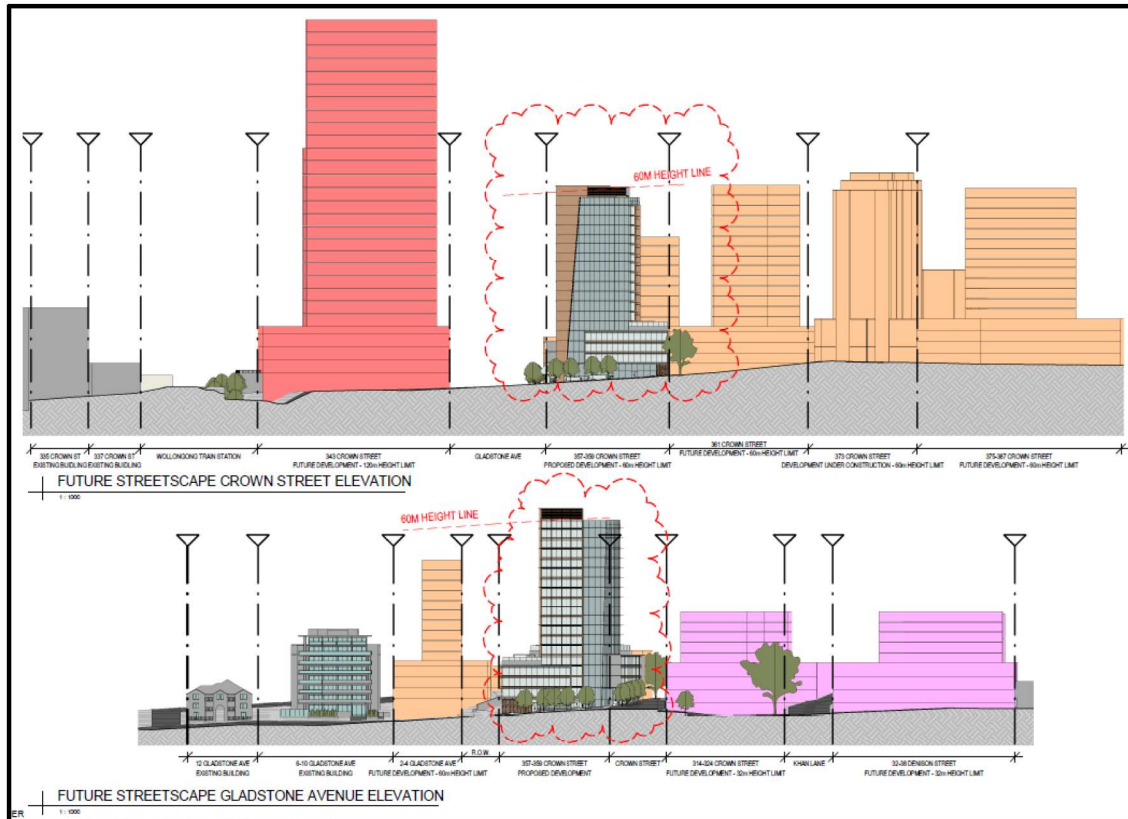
Proposed Streetscape Elevation (Future) (*Source: DWA)
